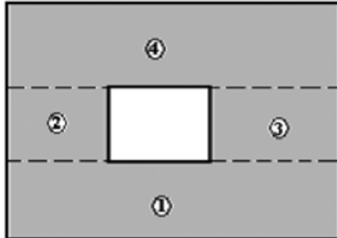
Discretization of Spandrel and Sill Portion in a Single Solid Element
